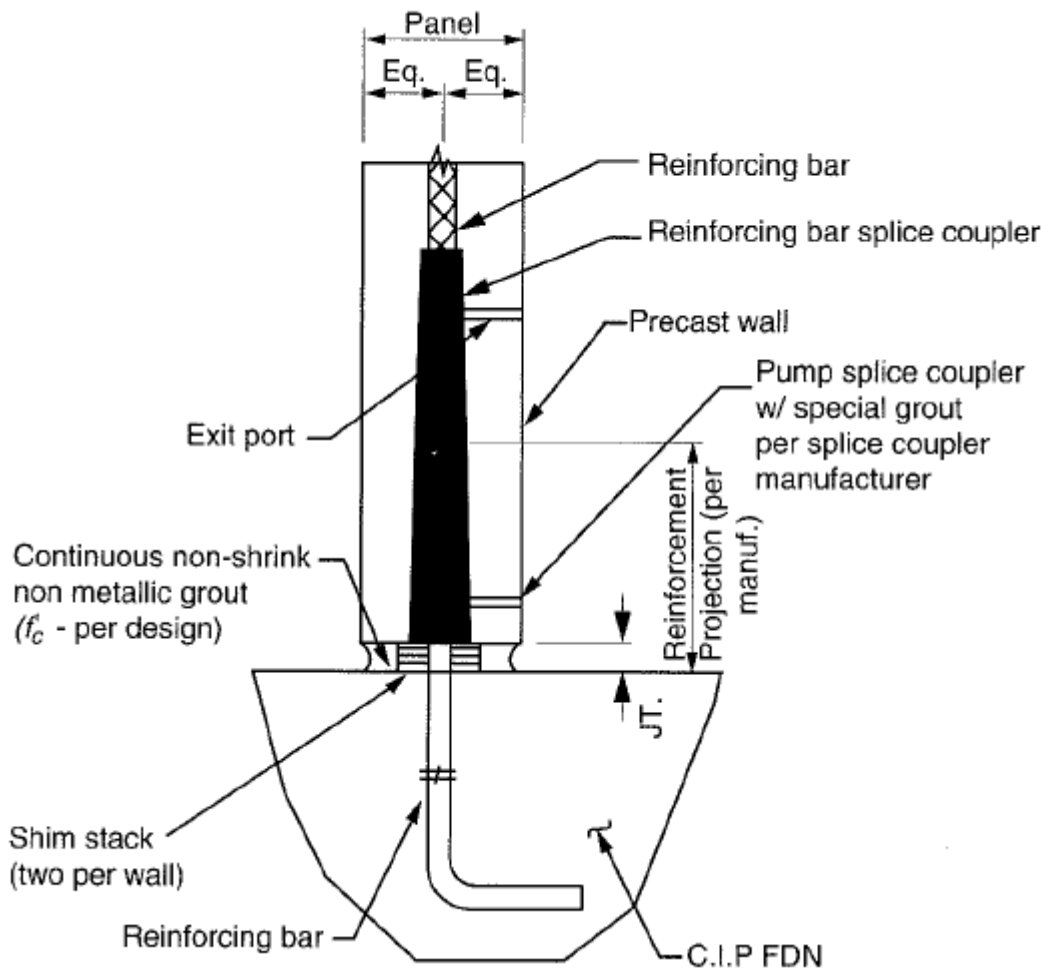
Grouted Sleeve Anchor Connection (Oswald and Bazan 2013)
